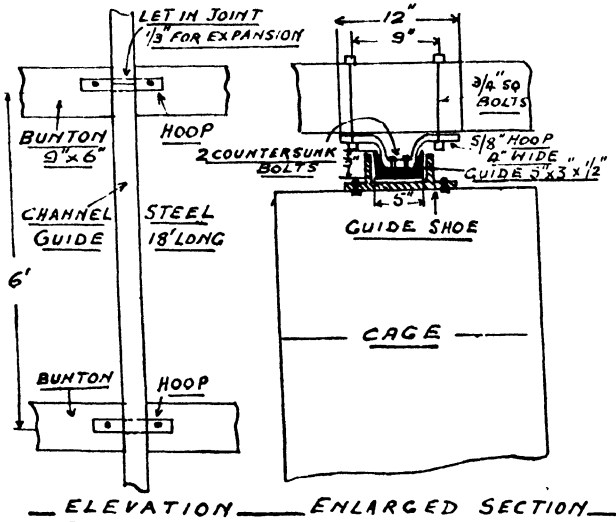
Channel-steel Cage Guides in Circular Shaft.
